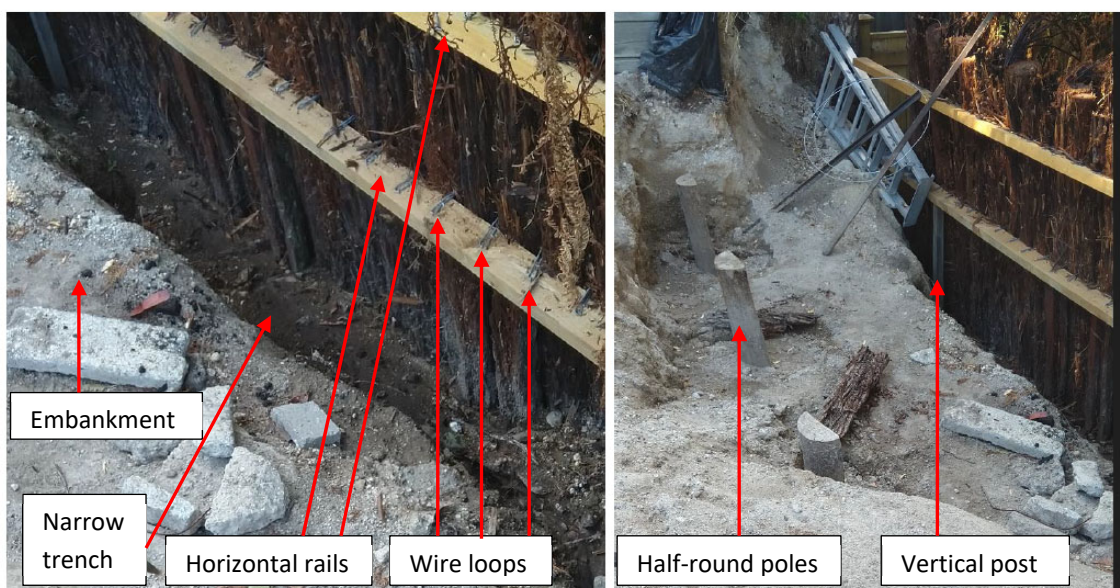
Photographs showing the excavation and punga wall from the owner's side
